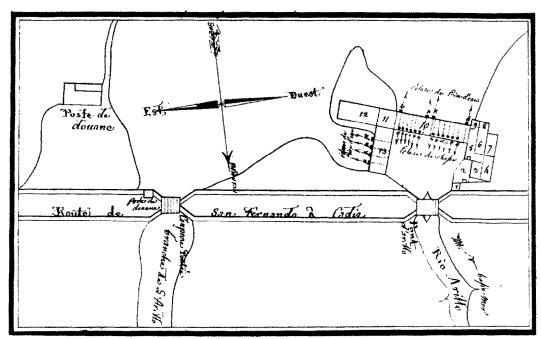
(a). The Arillo Mill in Cadiz. Water flowed into the pond through eight sluices perpendicular to the mill; it flowed back to the sea through twelve other gates which operated twelve horizontal wheels. Detail of a manuscript plan drawn by French engineers in 1826 (Serv. Hist. Armée de Terre, Vincennes, France).
